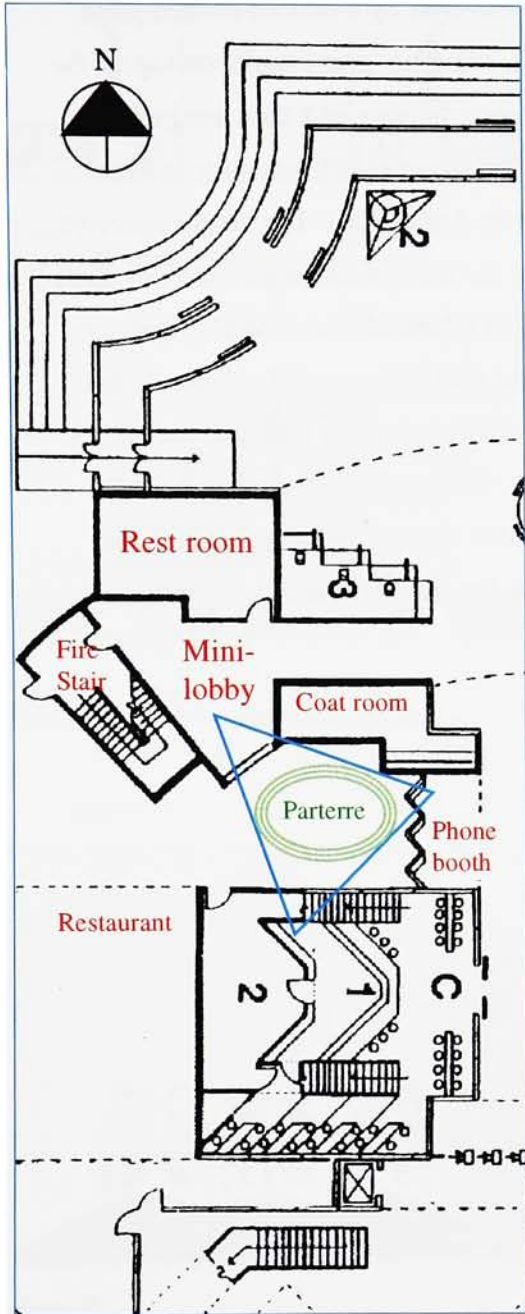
First Floor Plan Segment of The Youth Center for Art and Science.
